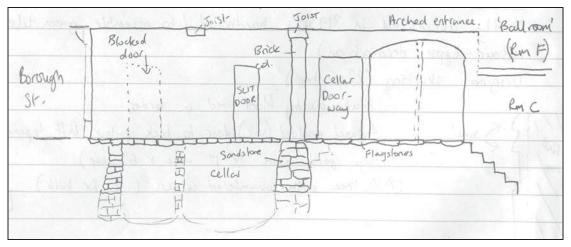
Sketch, from notebook, showing the wall between Rooms D & E.
